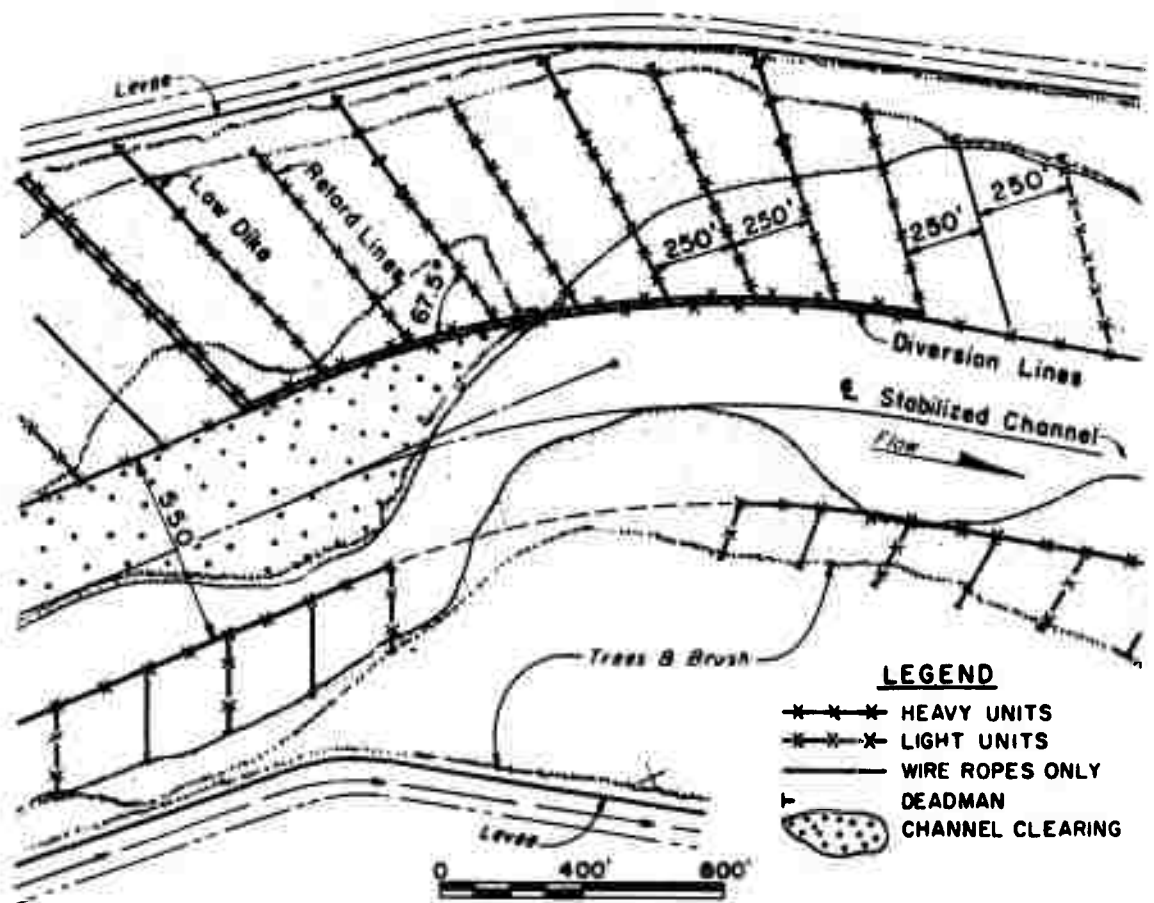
Typical layout of jetty system on Rio Grande Floodway, Cochiti to Rio Puerco Unit
